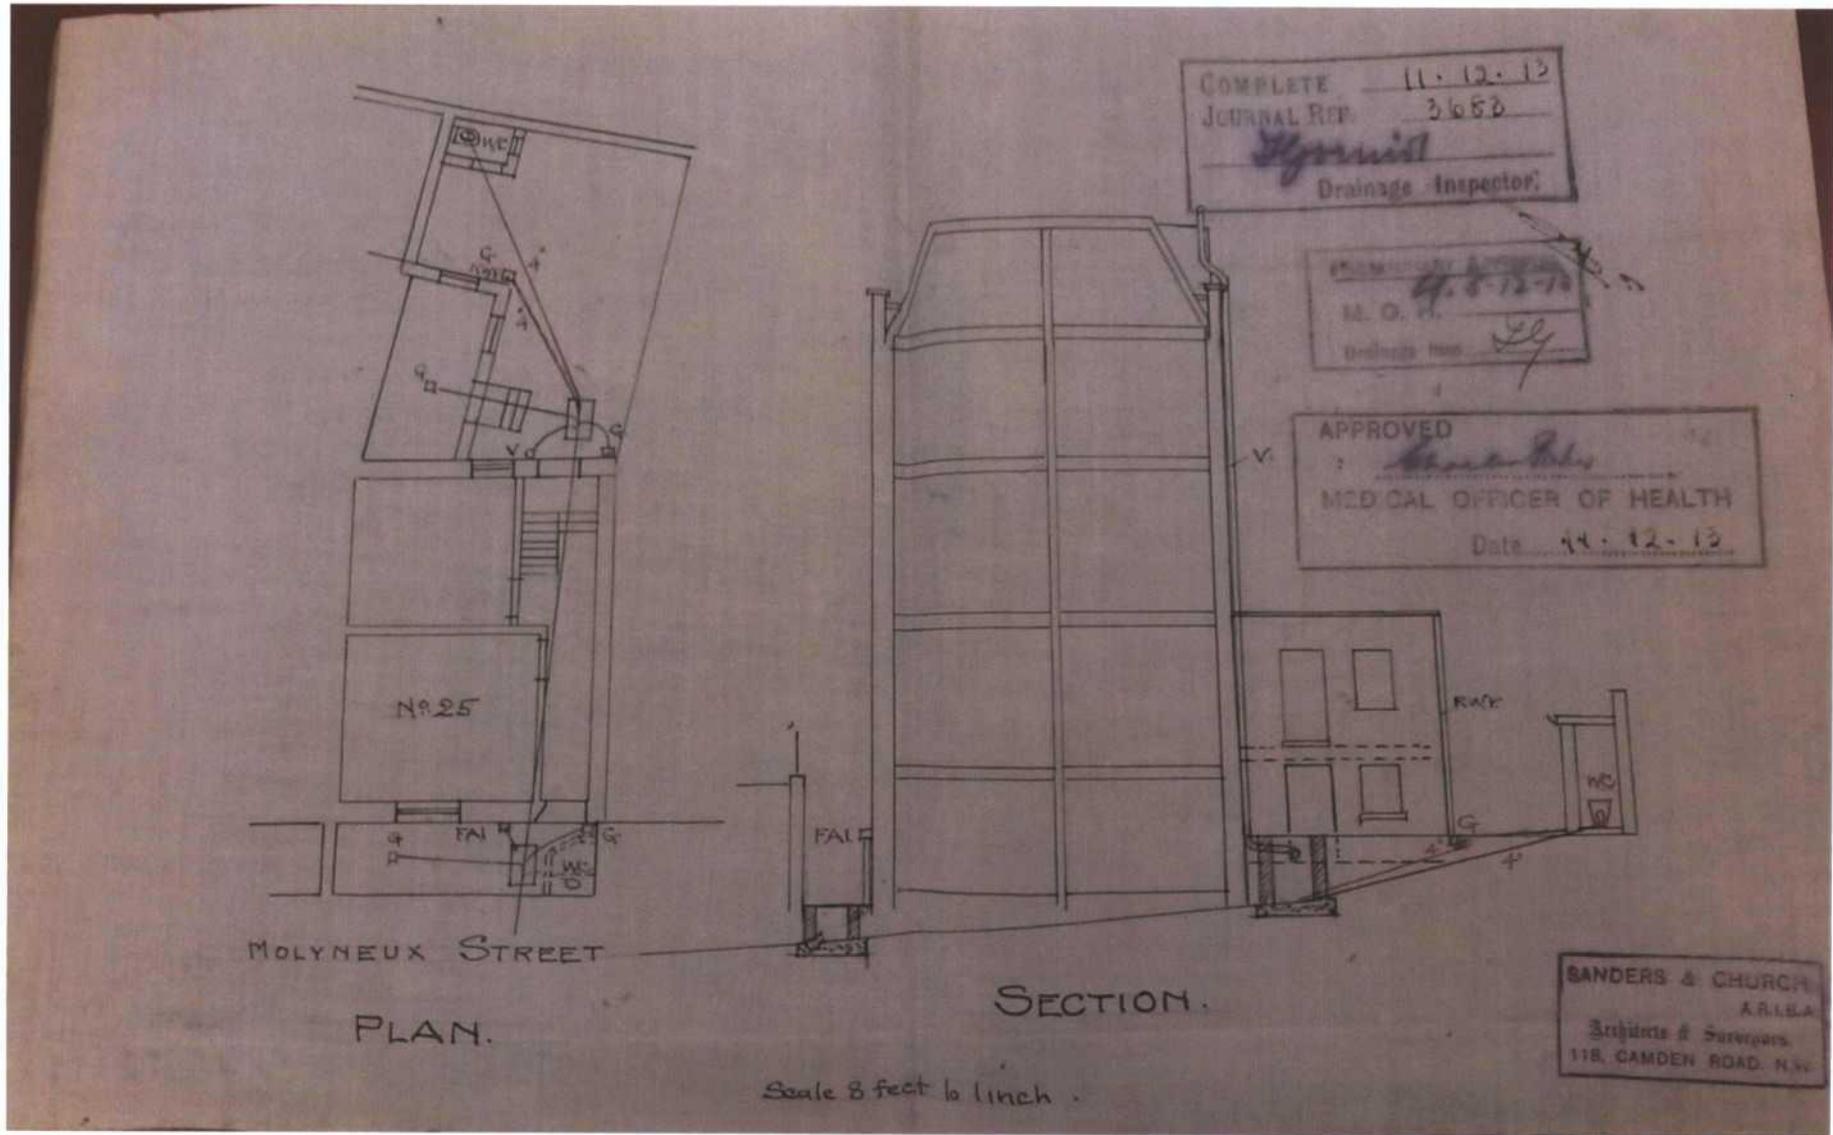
Drainage Plans of 25 Molyneux Street with the washroom unconnected to the rear room of the house, 1913.
